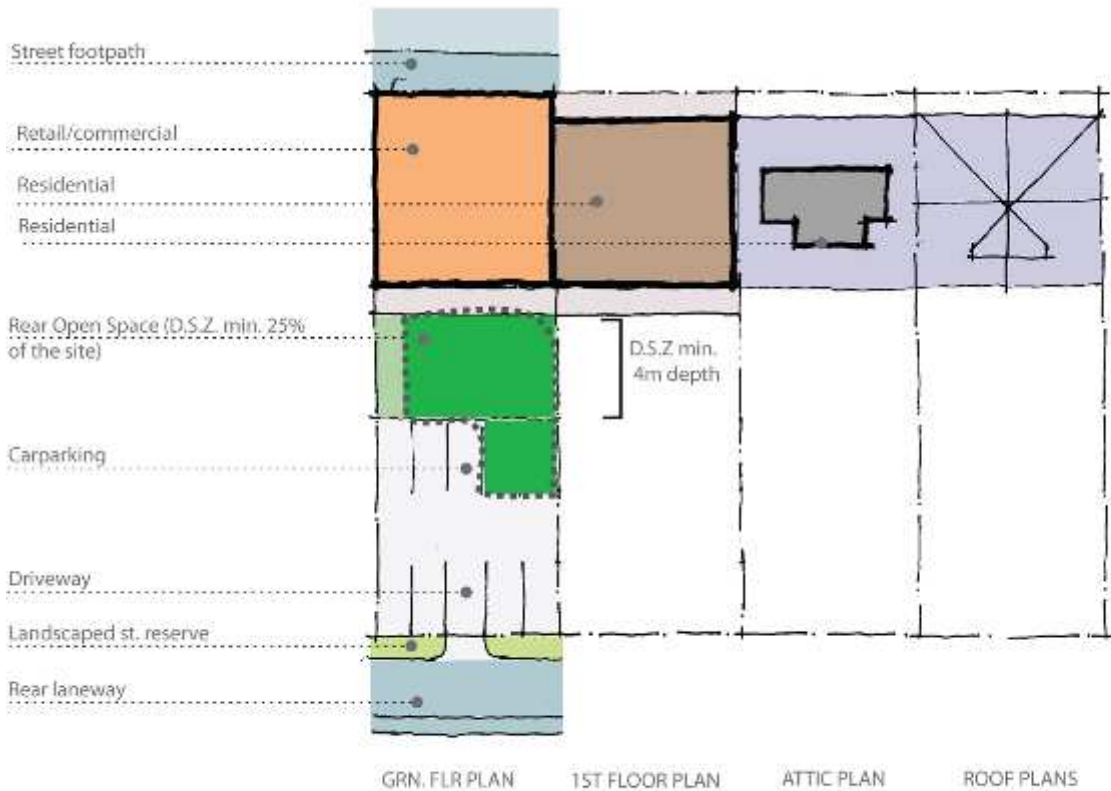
Mixed Use Development Main Street) Residential (lower street)
